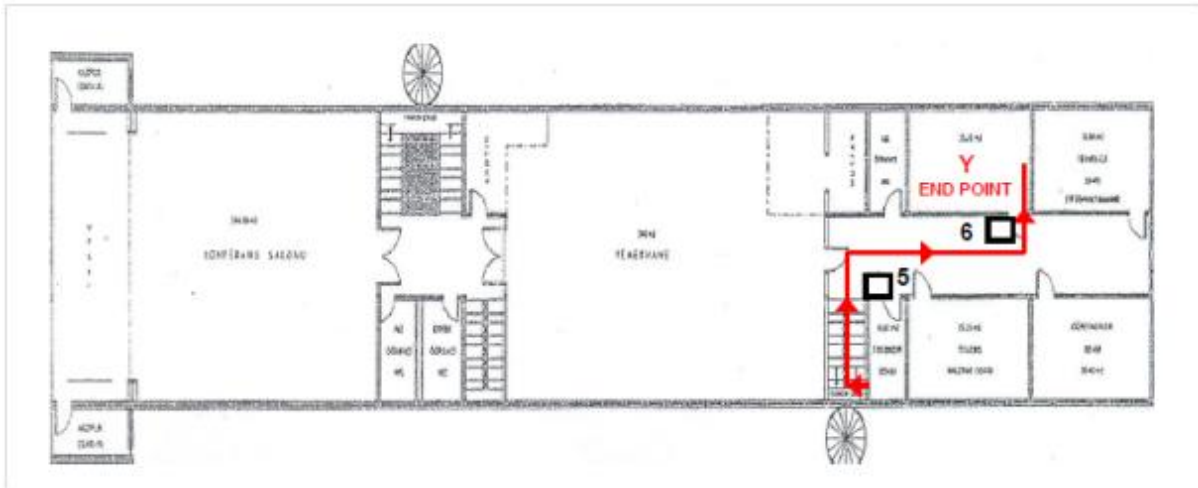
2nd floor plan of the building with the end point Y (biology laboratory) and the route.
